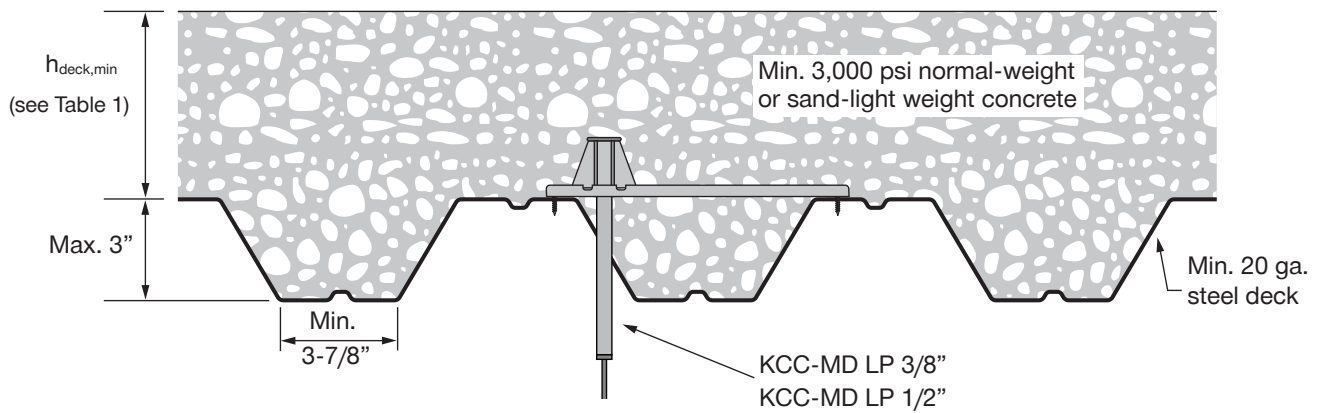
D — Installation of KCC-MD inserts in the soffit of concrete filled metal deck floor and roof assemblies-over flute incline (W-deck)
